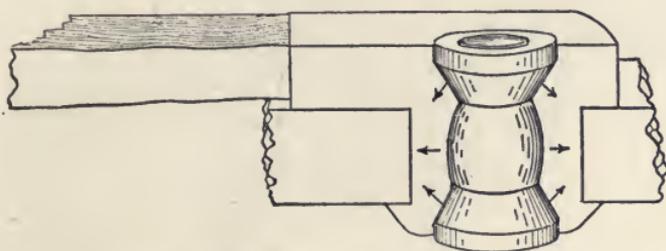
Pin Expanded Bond. G. E. Co. Type with Steel Core.
